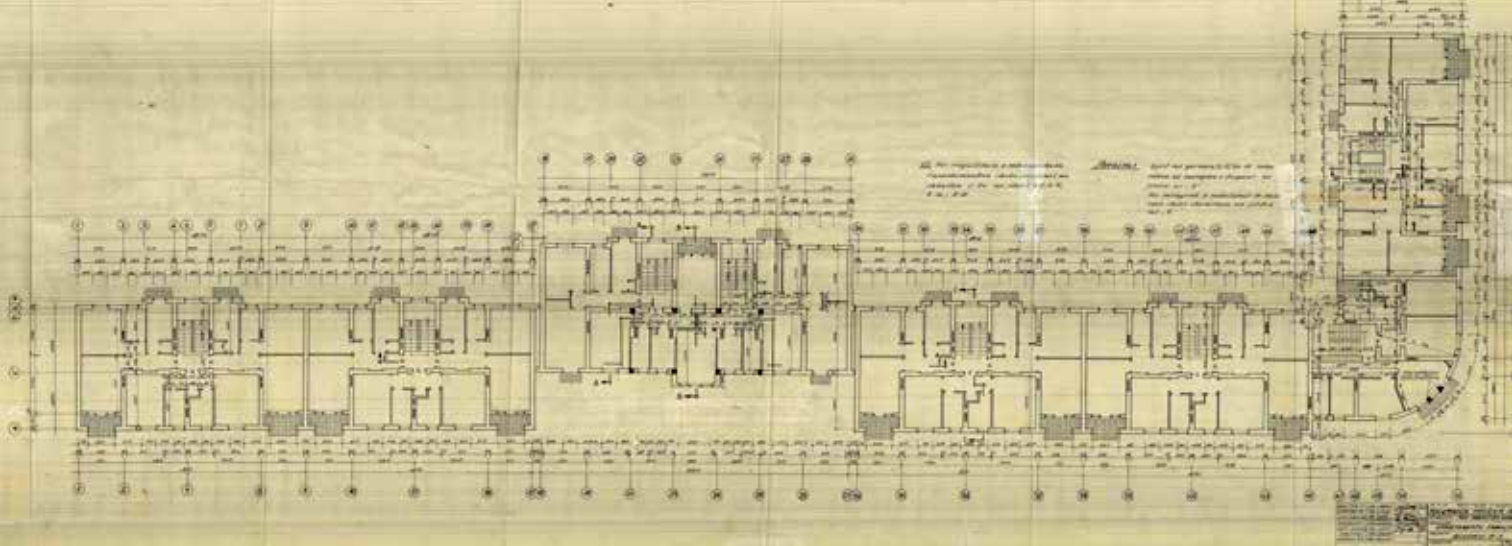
Skënder Luarasi, Block D-1 Apartments, Durrës Street, Tirana, 1950, construction document, typical residential floor plan (TCAC)
